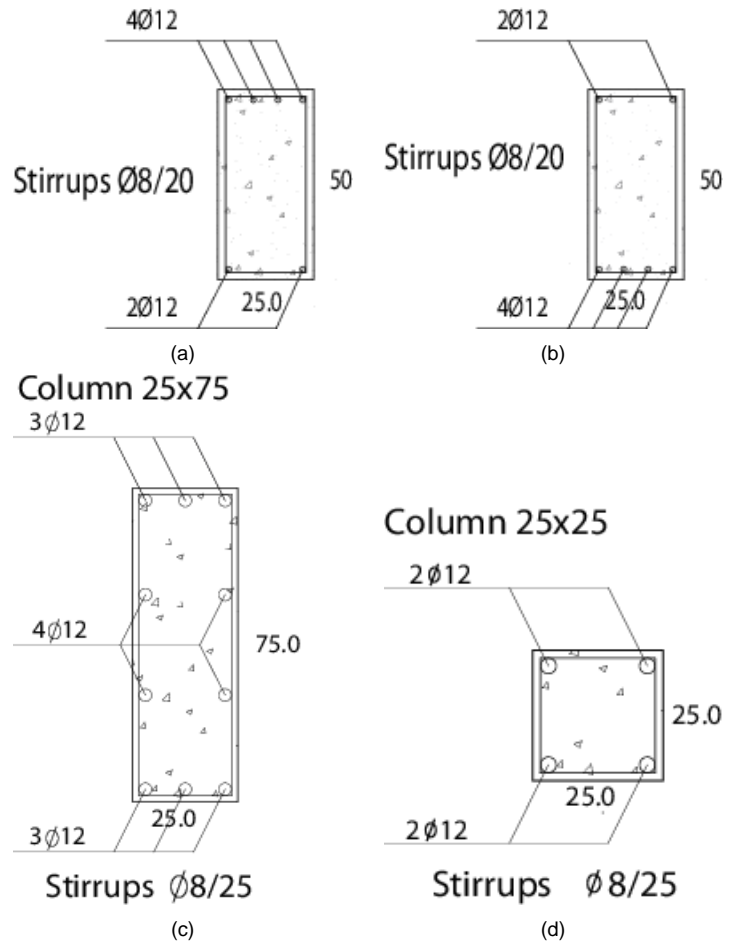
Details of (a) edge sections of beam 5, (b) mid-span section of beam 5, (c) column 2 cross-section and (d) cross-sections of all other columns (section has been selected with reference to Fig. 2)
